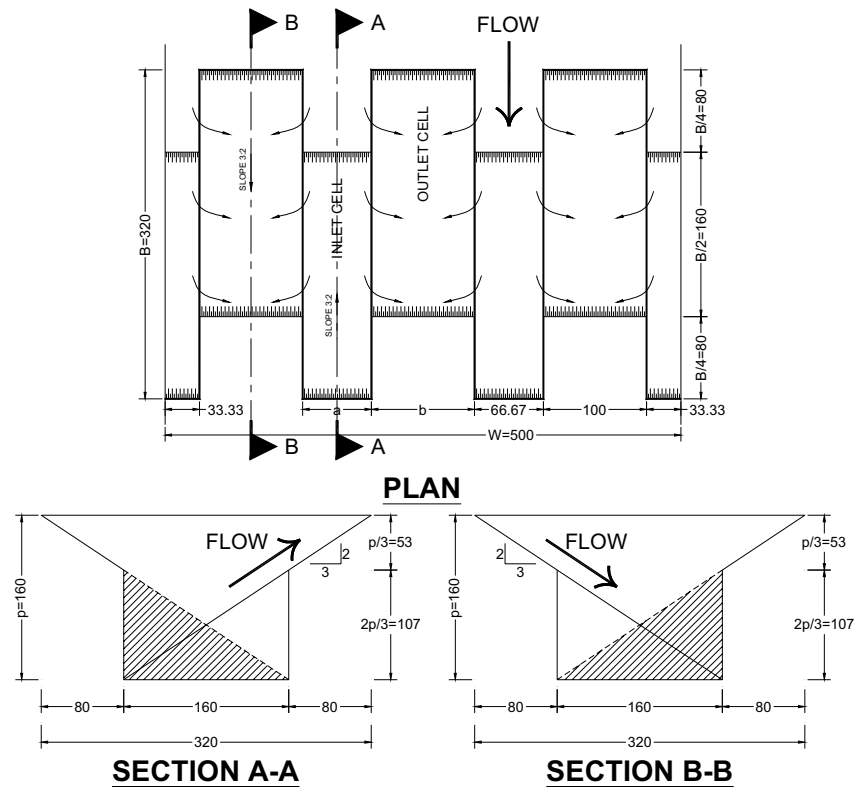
Plan and section of model P₃M₄ (both sides ramping), (dimensions in mm)
